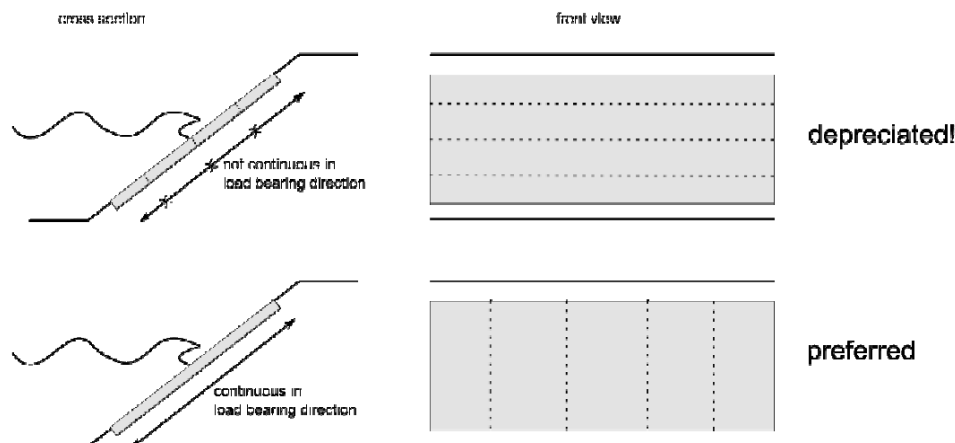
Recommendations for the design of transition zones and internal transitions when constructing Elastocoast revetments according to [20]
